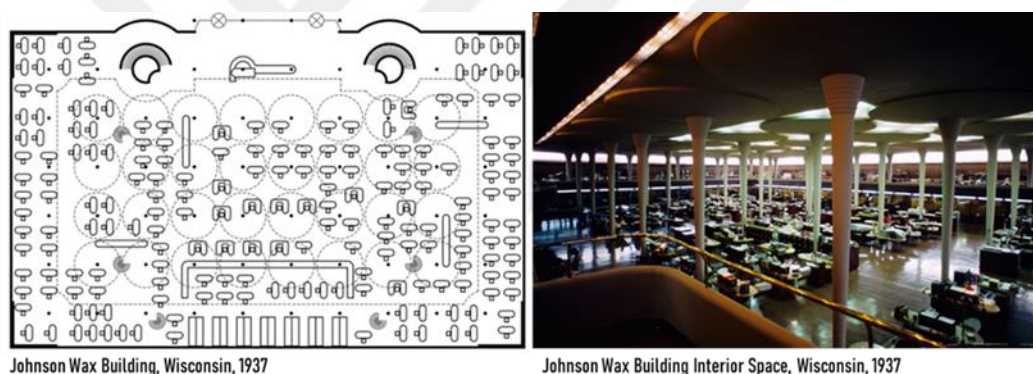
Taylorist open plan office workplace. Source for the plan (Anton, 2015) and image (Minner et al., 2010)
